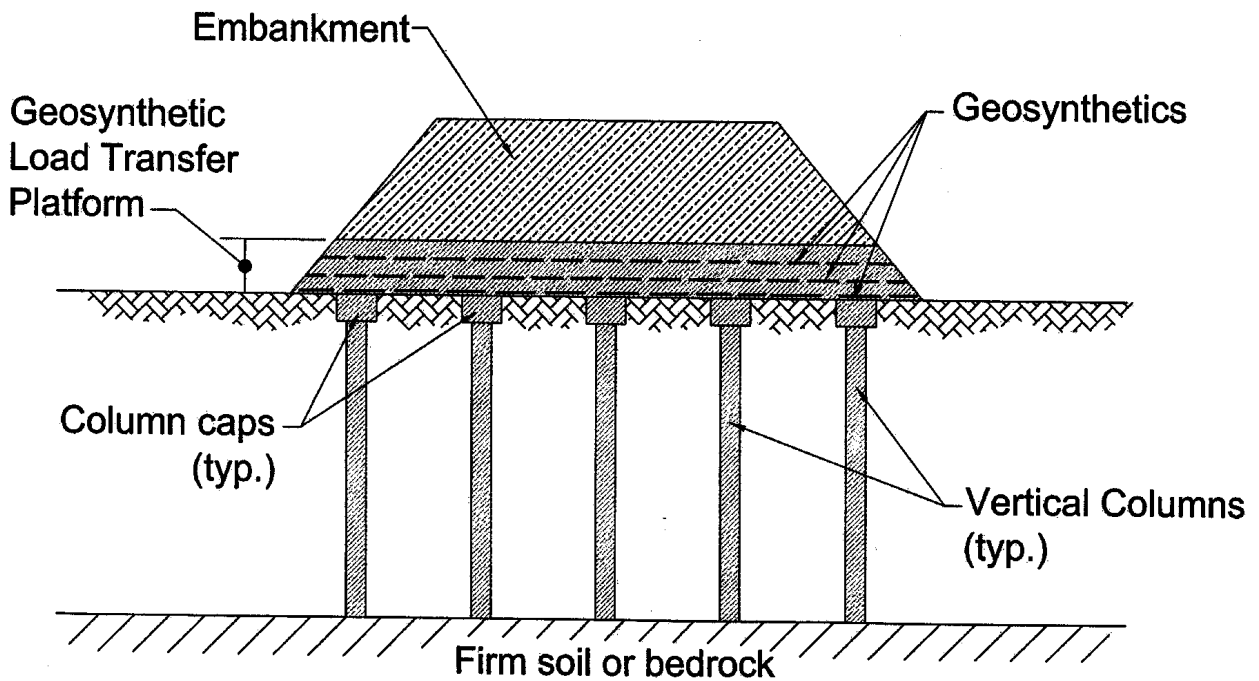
Column Supported Embankment with Geosynthetic Reinforcement.
